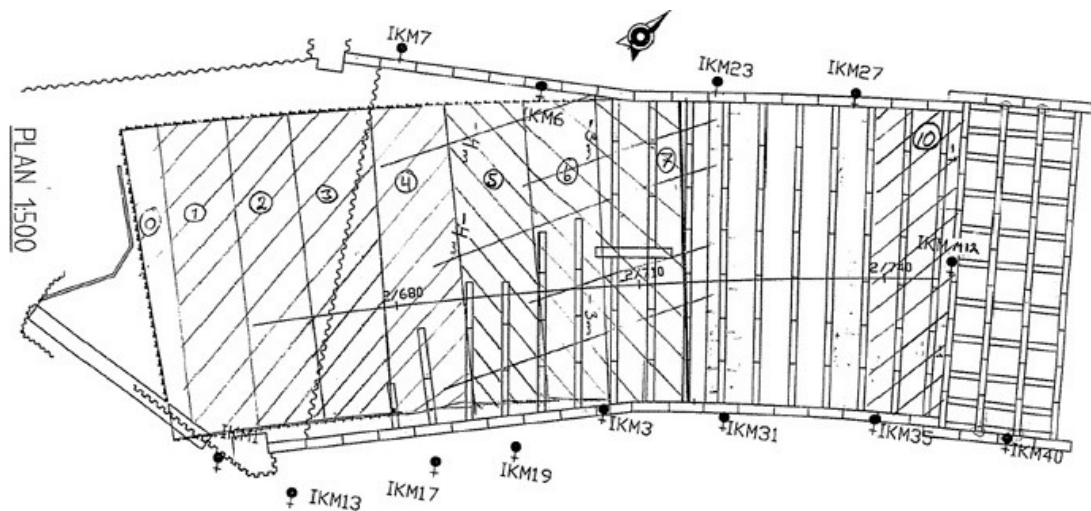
Plan view of tunnel. Inclinometers marked as IKM. [24]
